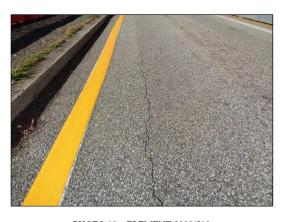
ELEMENT 8099/510 VIEW OF UP TO MODERATE SIZE LONGITUDINAL CRACKS IN ASPHALT WEARING SURFACE
